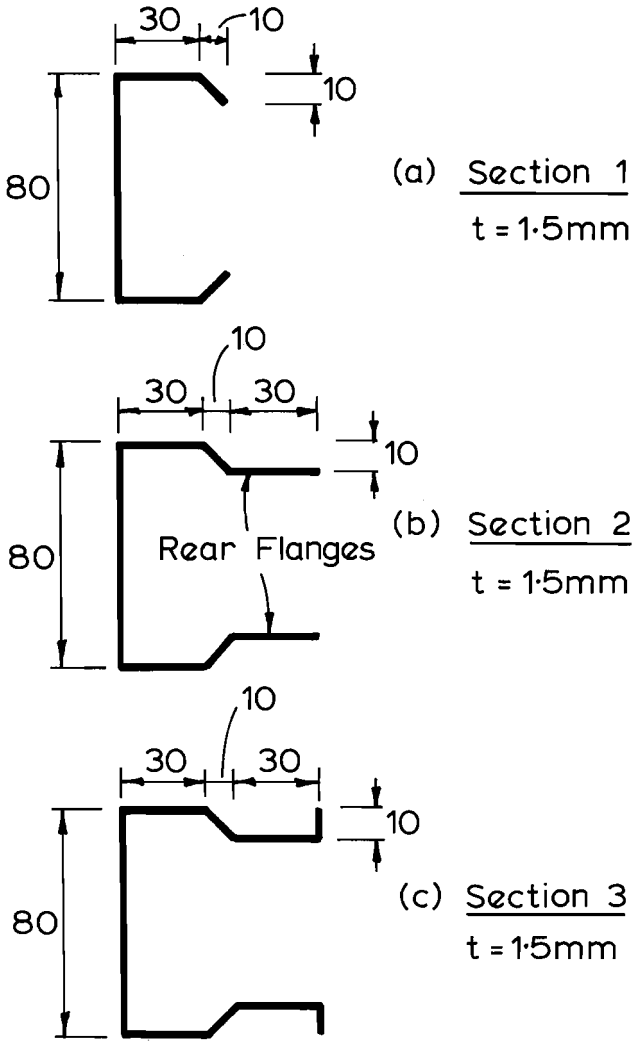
GEOMETRY OF SECTIONS STUDIED
